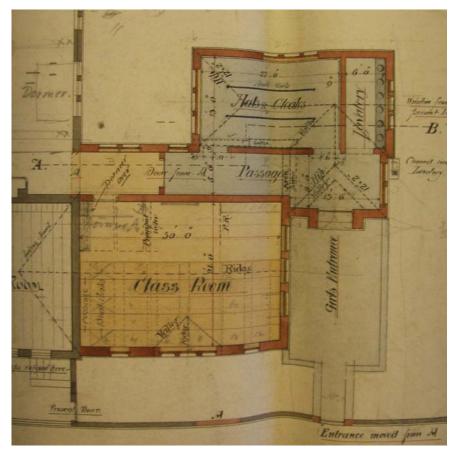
Detail of the proposed additions at the north-east end of the building, 1891 (CRO(B) Z1041 1875-1904)
